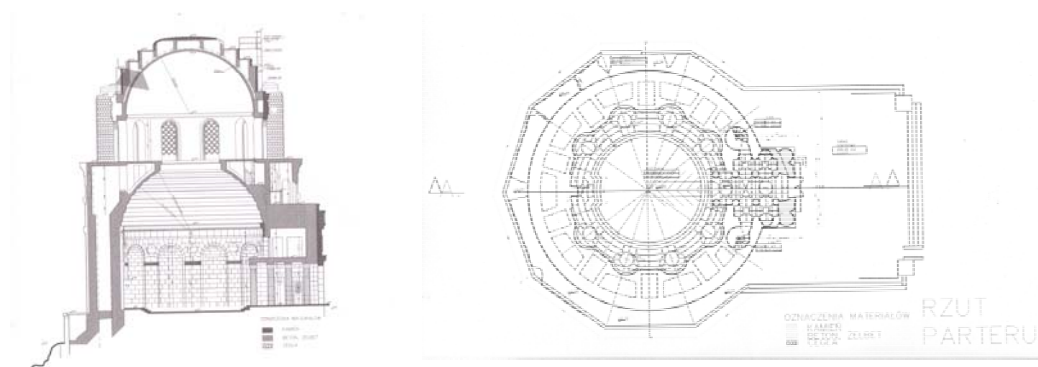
a, b. Cross section and ground floor plan of the Bismarck Tower (Goćław Tower) in Szczecin. Source: Halina Rutyna
